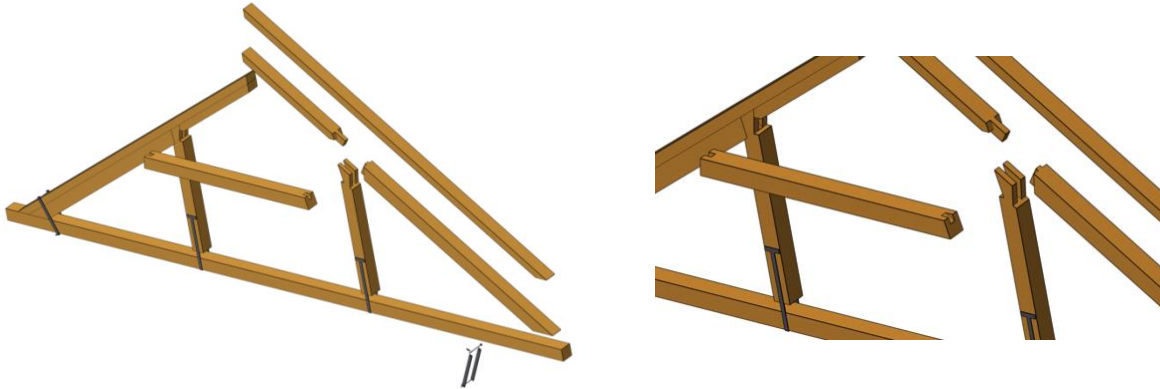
Santarém Cathedral: Exploded view of the truss and connection details.
